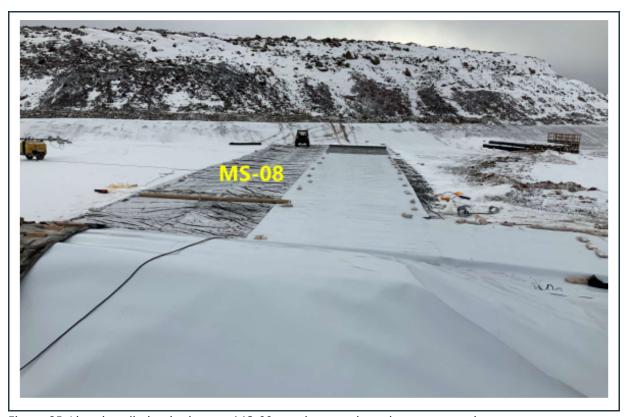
Liner installation in the new MS-08 pond, currently under reconstruction.
